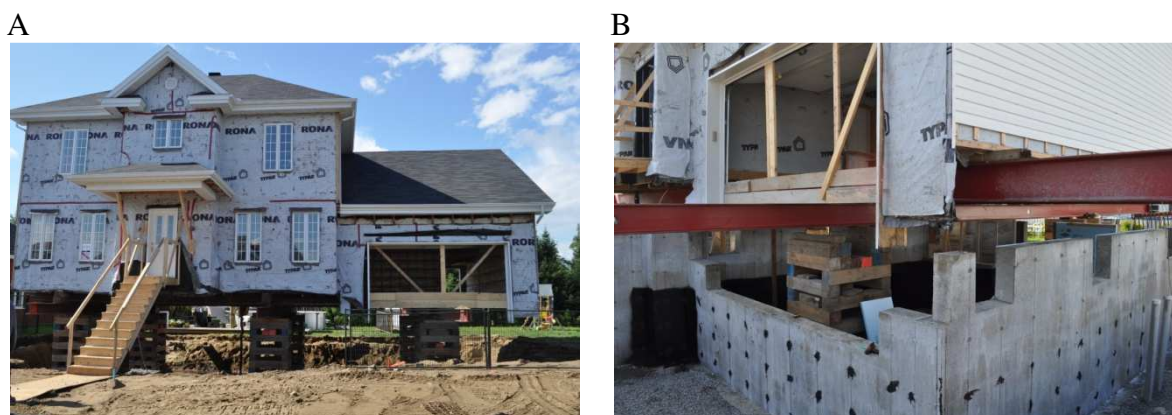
Replacement of the concrete foundation walls. All the masonry and covering stones were first removed. Houses (wood-framed) were then lifted up from their foundations. Concrete foundations were then demolished and replaced.
